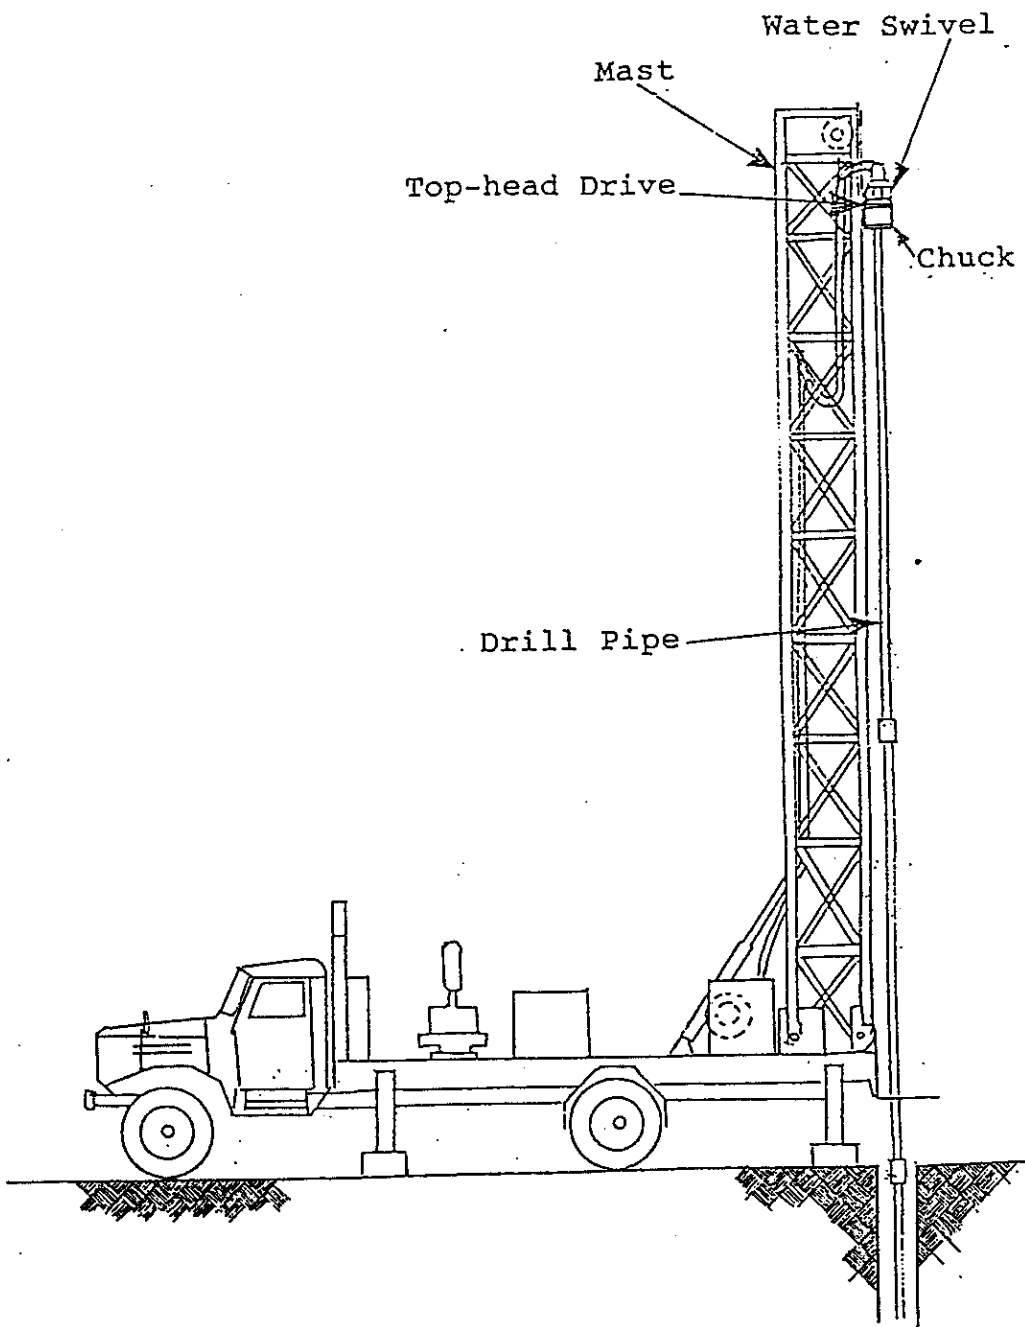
TOP-HEAD DRIVE TYPE DRILLING MACHINE
